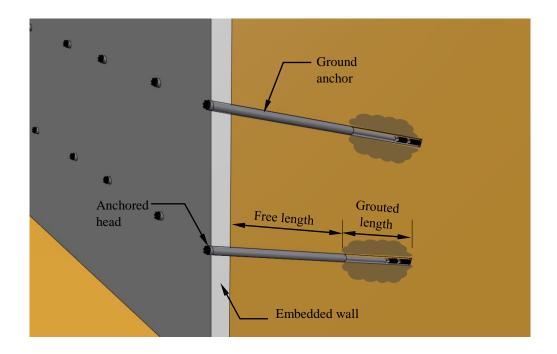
Tied-back Wall Support System Using Ground Anchors
